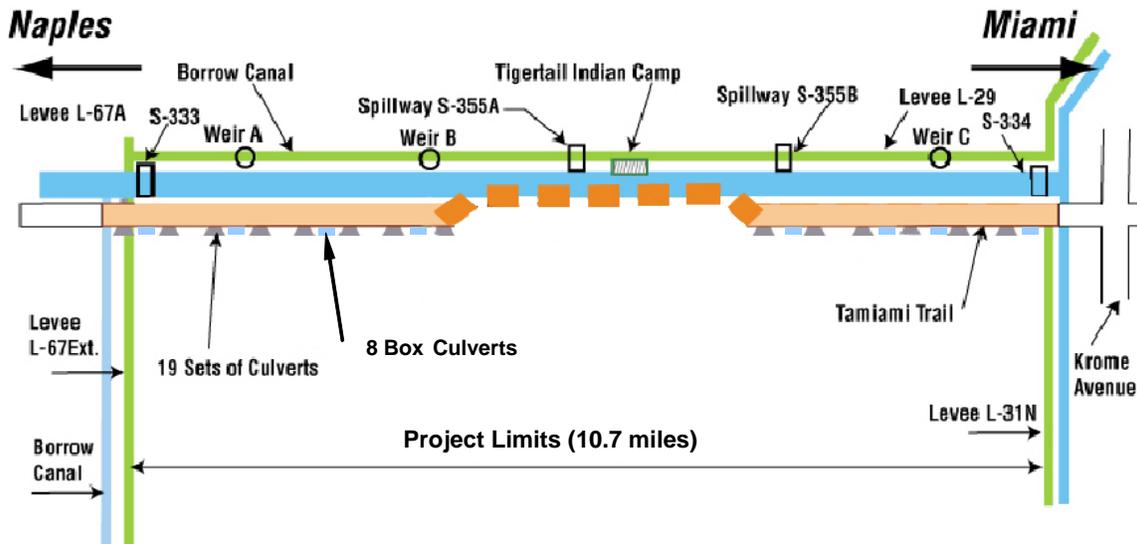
Plan view of Alternative 3 (4-Mile Bridge Alternative) with full removal of the old Tamiami Trail.
